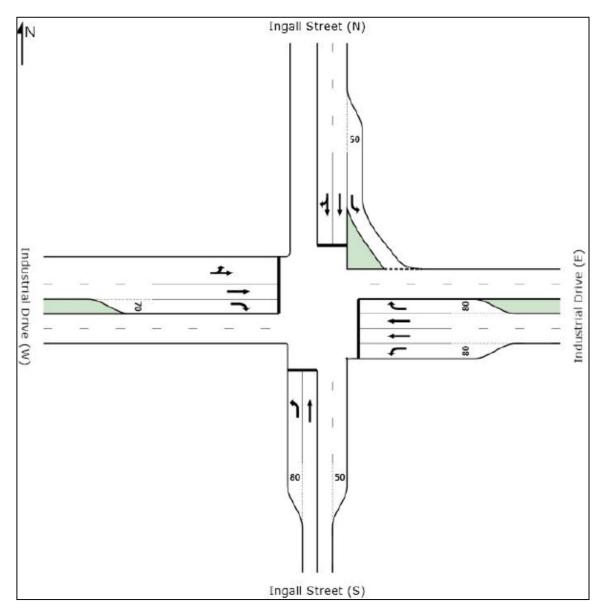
Existing layout of Industrial Drive / Ingall Street intersection
